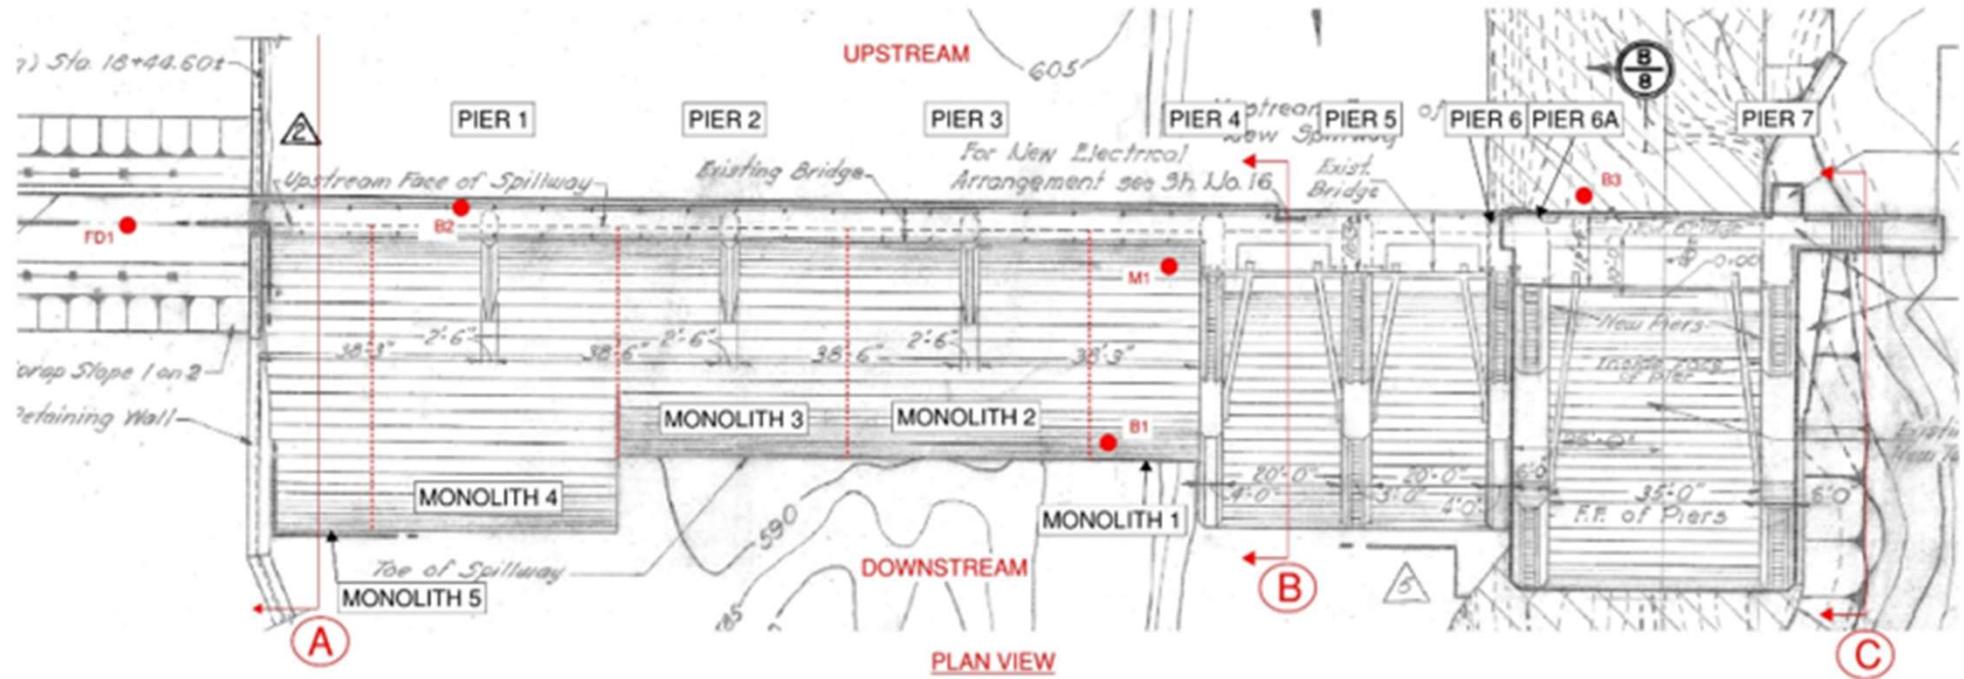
Plan View Showing Bedrock Core and Embankment Boring Locations
